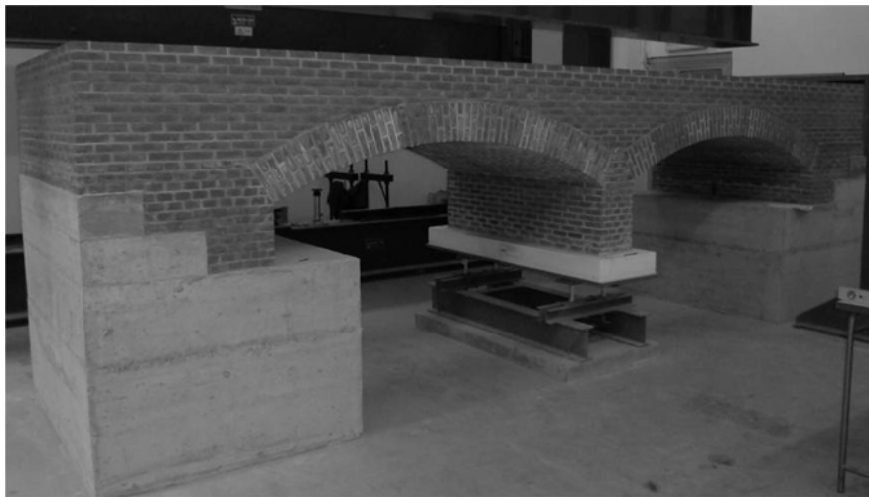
The scaled masonry bridge: notice the settlement application device under the central pier.
